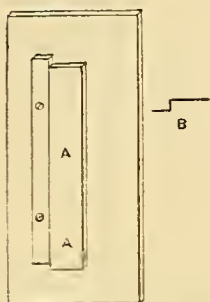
PLATE OF METAL BETWEEN GROOVES.
